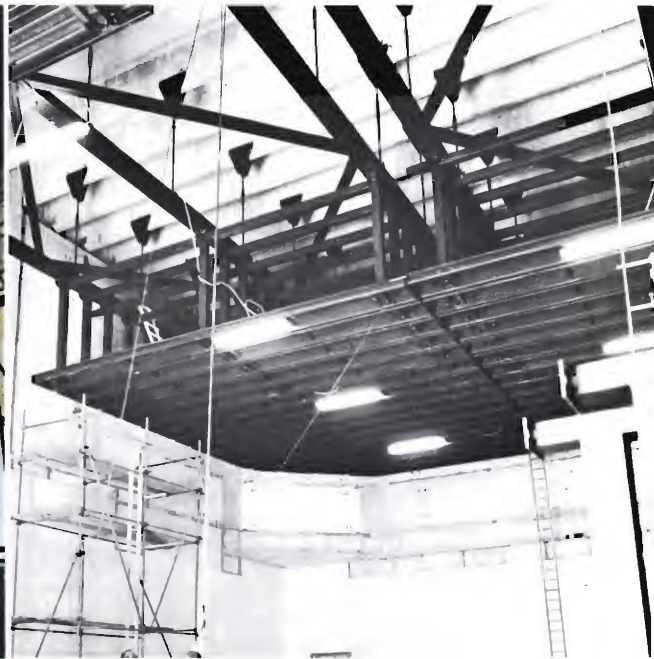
The acoustically isolated hangers support a grid structure with a slotted metal floor on which lighting men can walk around to move or elevate the lighting fixtures which are suspended on telescopes beneath it.
